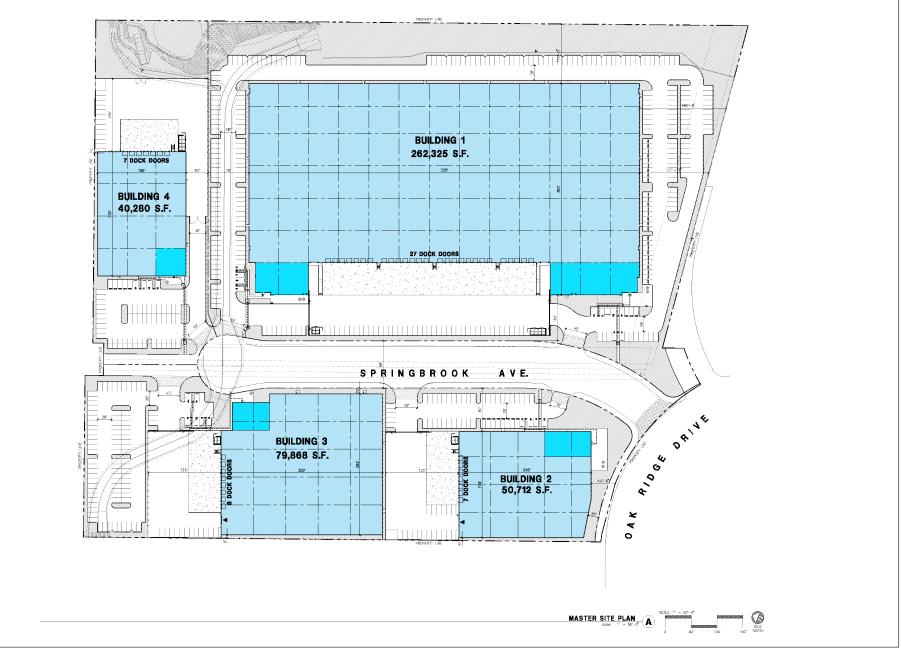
Site Plan Santa Clarita Commerce Center Project
